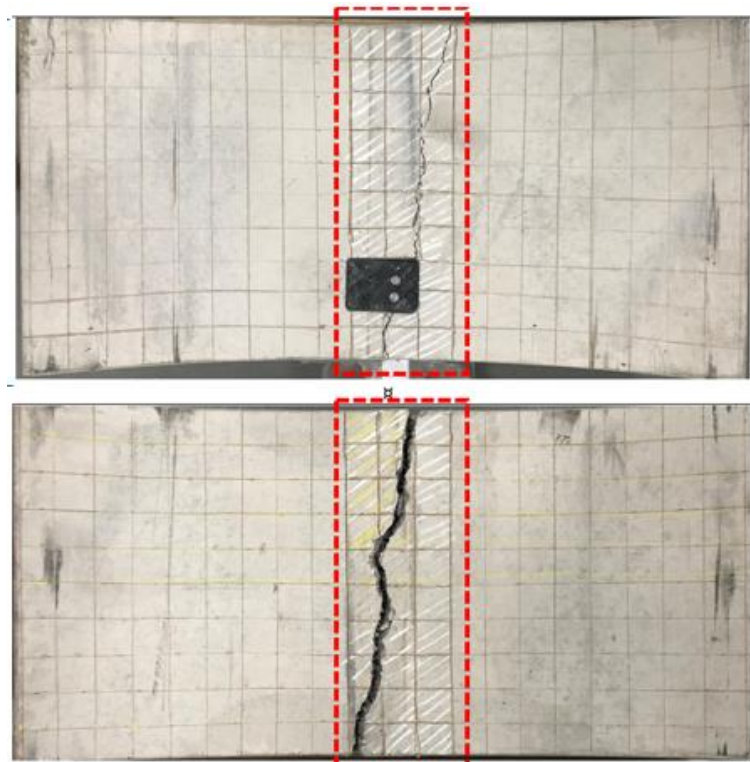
Cracking patterns of instrumented (above) and plain beam (below)
